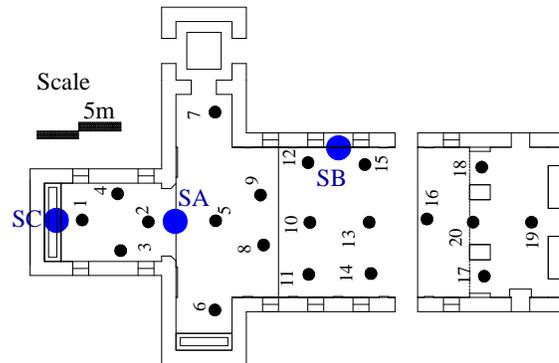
Basilica Ground Floor Plan with the zones demarcation (Floor plan courtesy: Engr.Thomas D'Costa).
